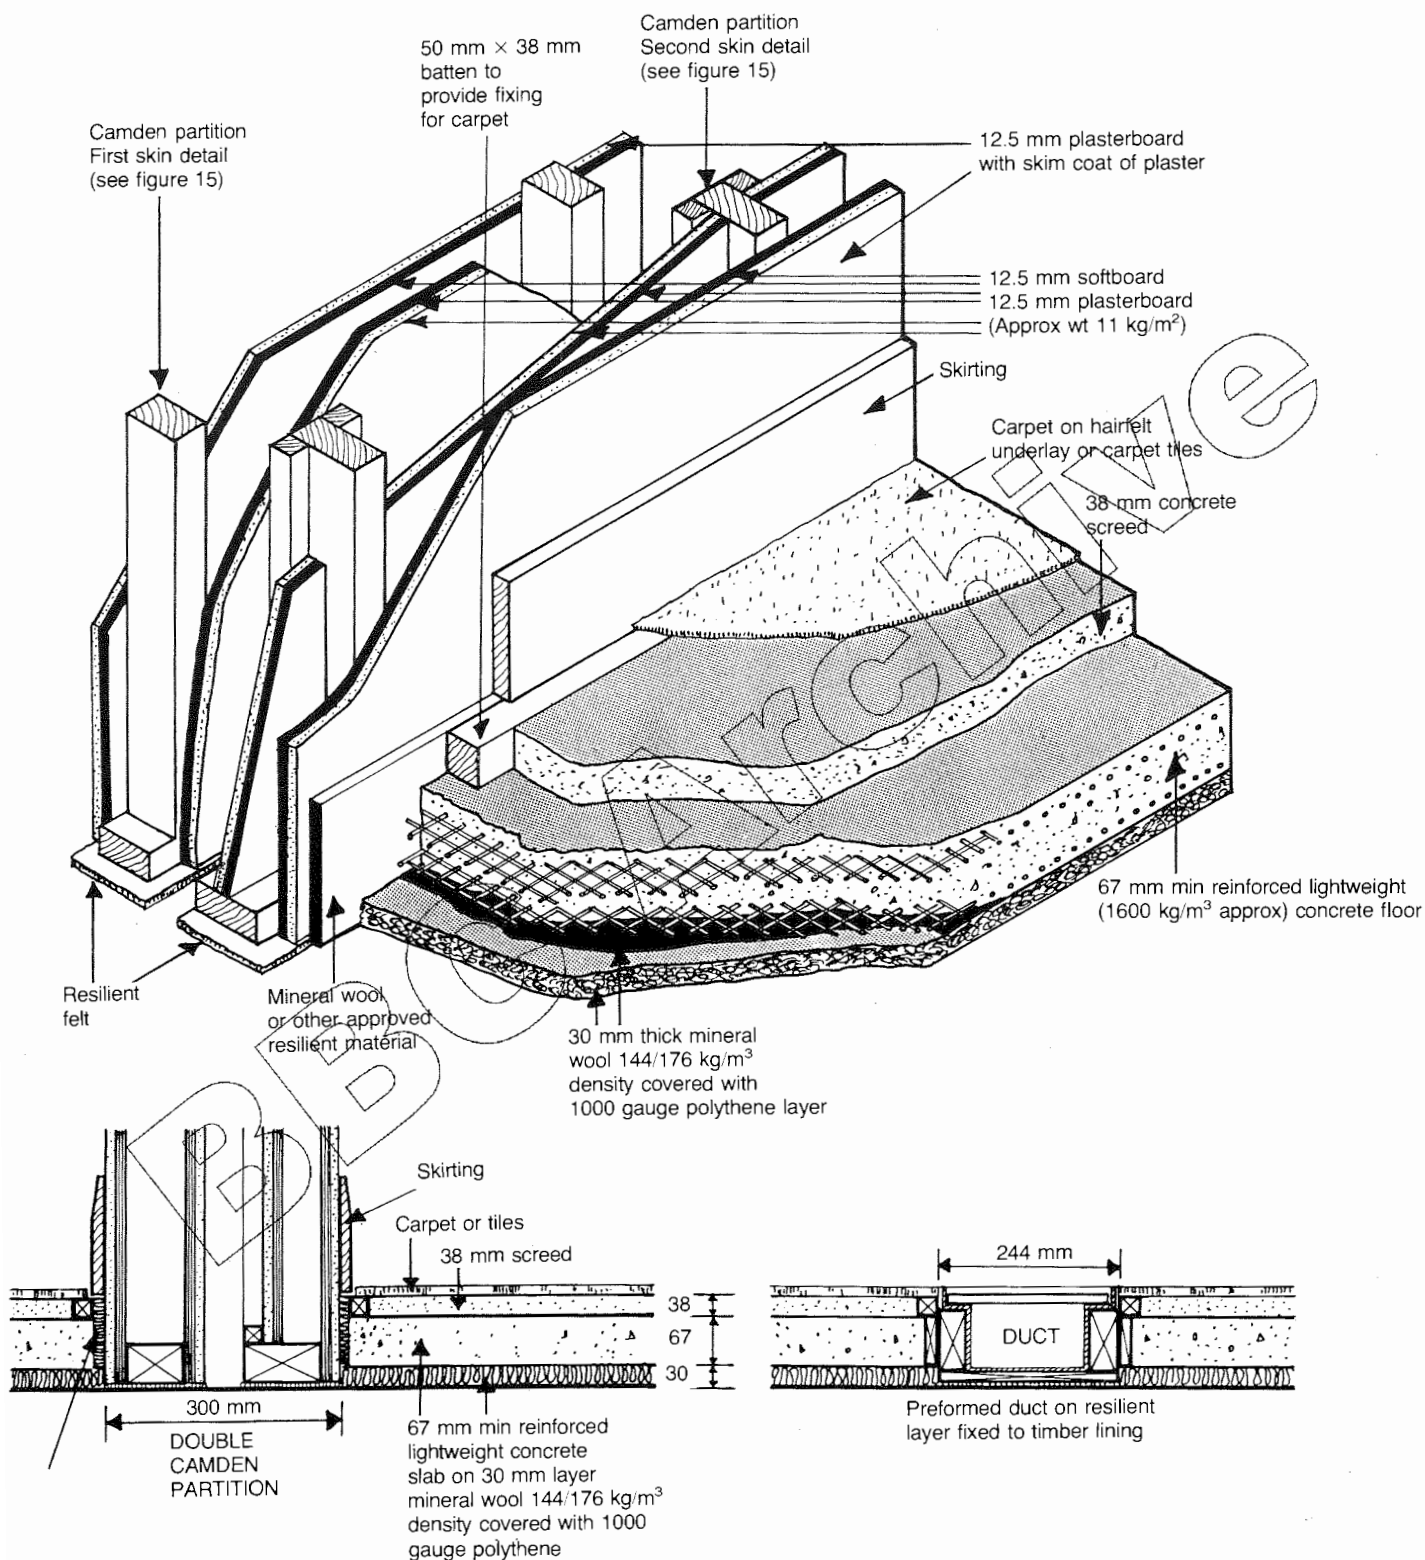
Typical Section through a Lightweight Concrete Floating Floor
